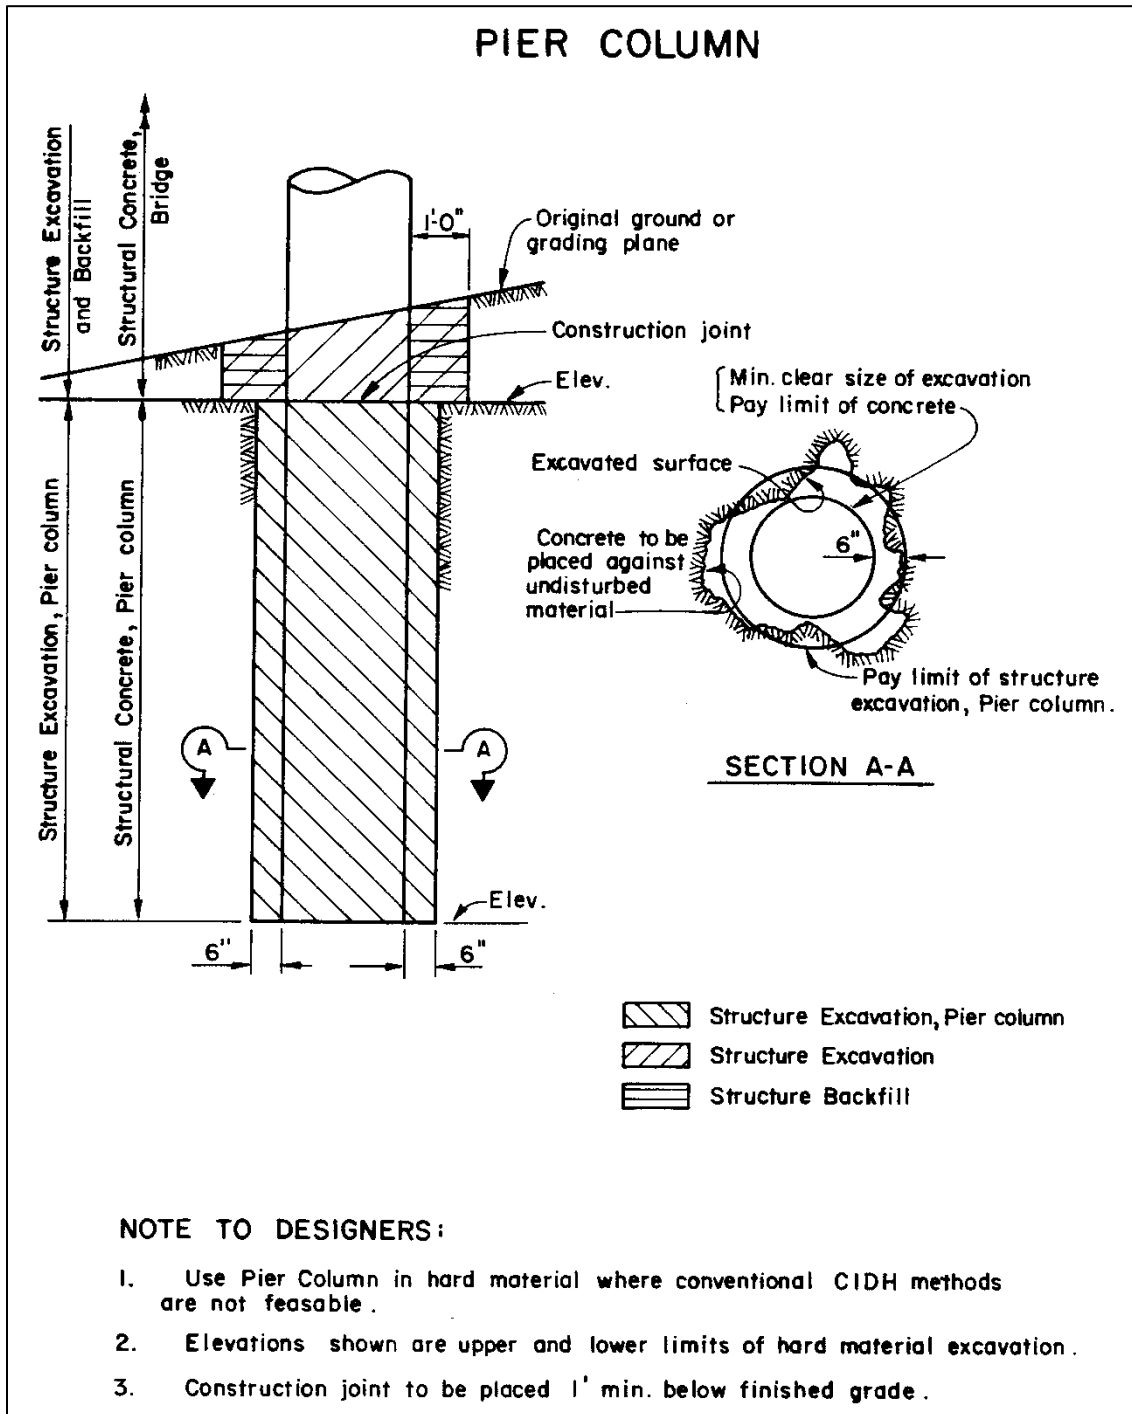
Pier Column - Caltrans Bridge Design Details, page 7-20.
